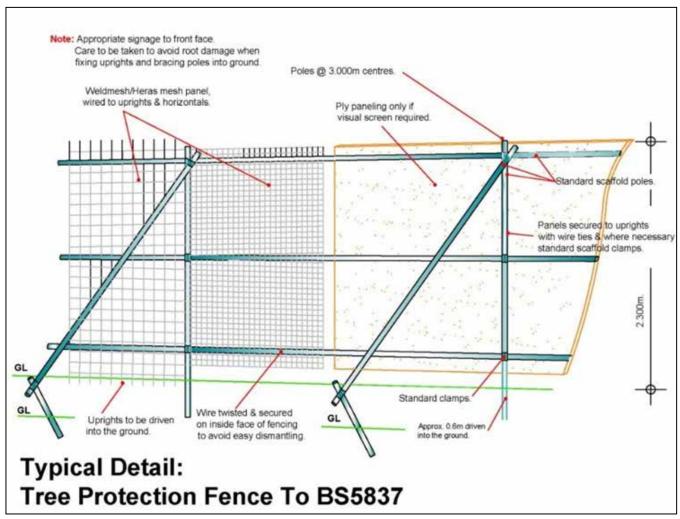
Typical Detail: Tree Protection Fence to BS5837
